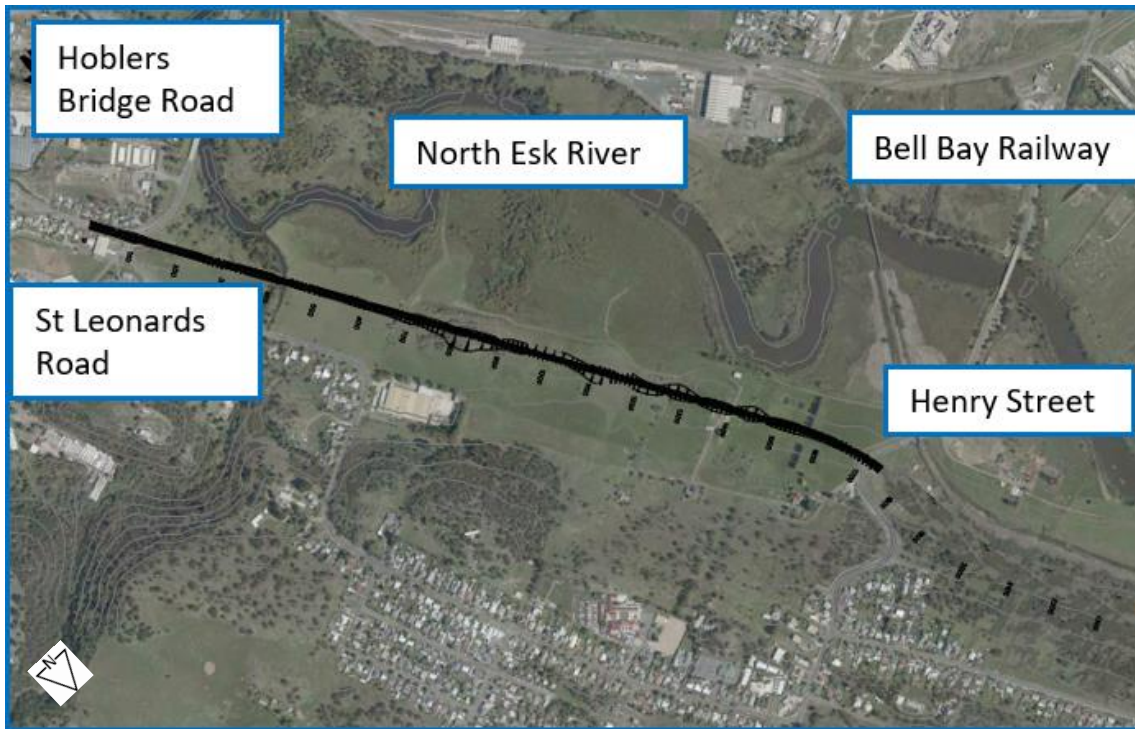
Northern alignment - Hoblers Bridge Road to Henry Street
